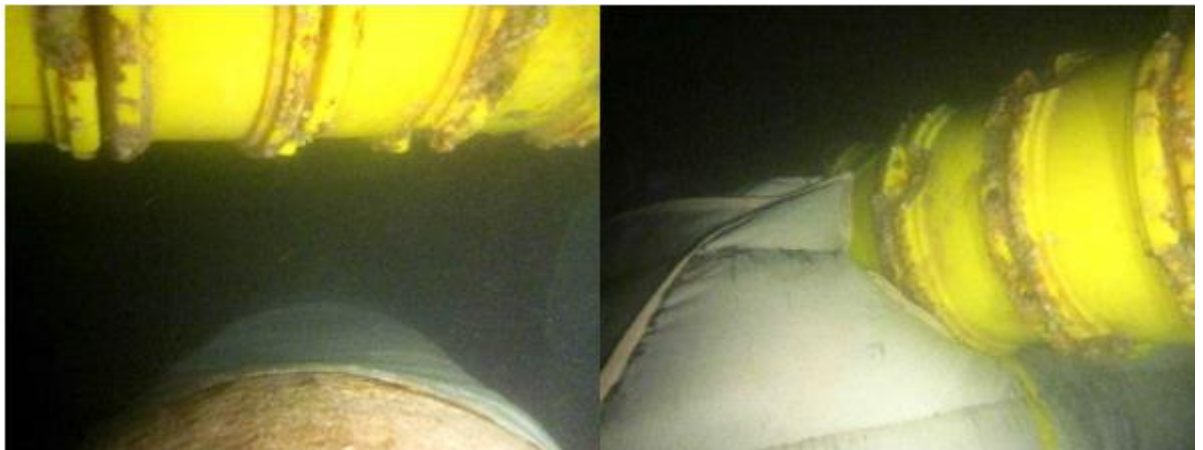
Photo showing the as-built vertical separation and cradle grout bag support.
